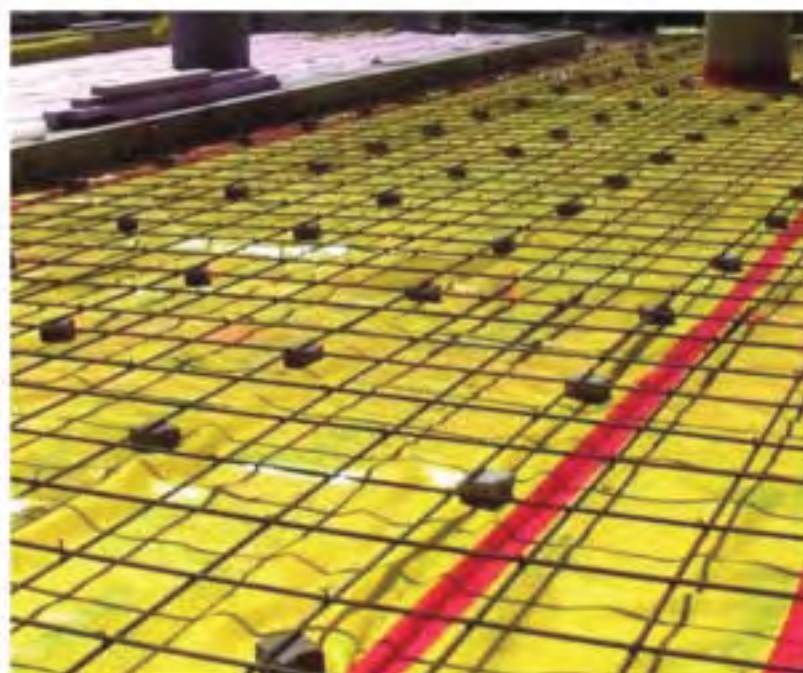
Proper sized and supported reinforcing bars help control slab curling and the width of cracking in slabs placed directly on a vapor retarder.
